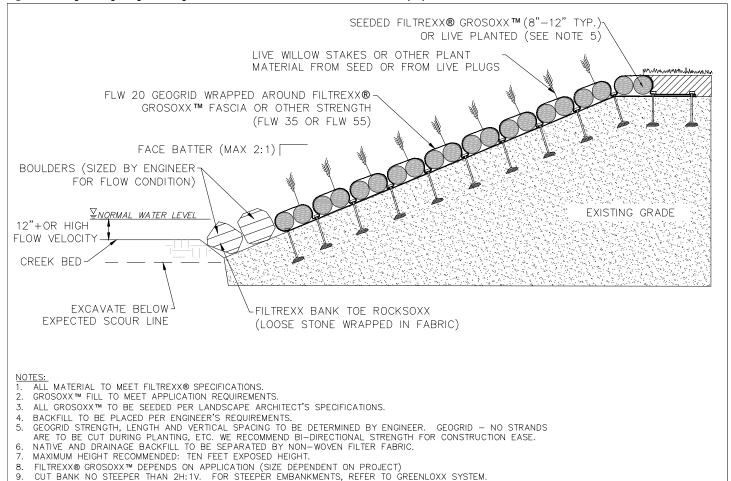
Engineering Design Drawings for Filtrexx Bank Stabilization - Reinforced with Riprap Toe
